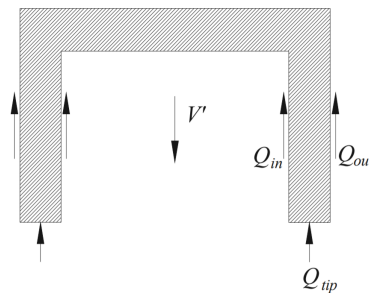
Forces acting on suction caissons during the installation stage (Guo and Chu (2014))
